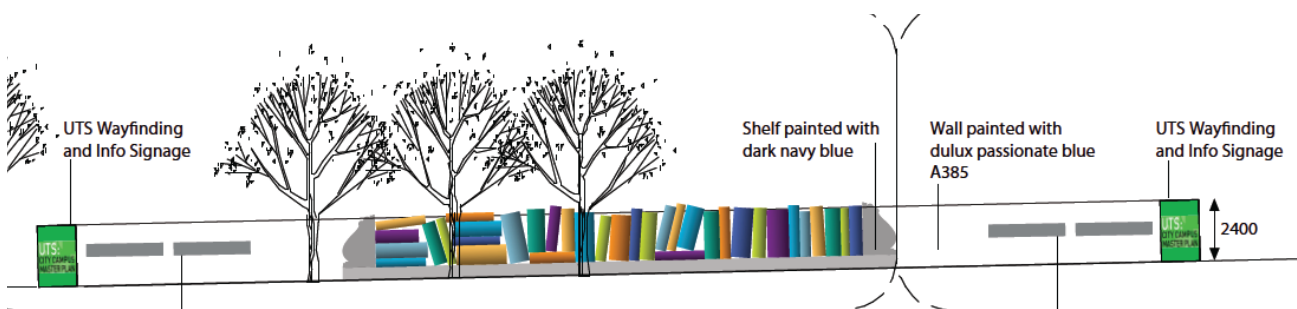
Approved Hoarding Design Treatment (D/2010/2139) - Jones Street Elevation
